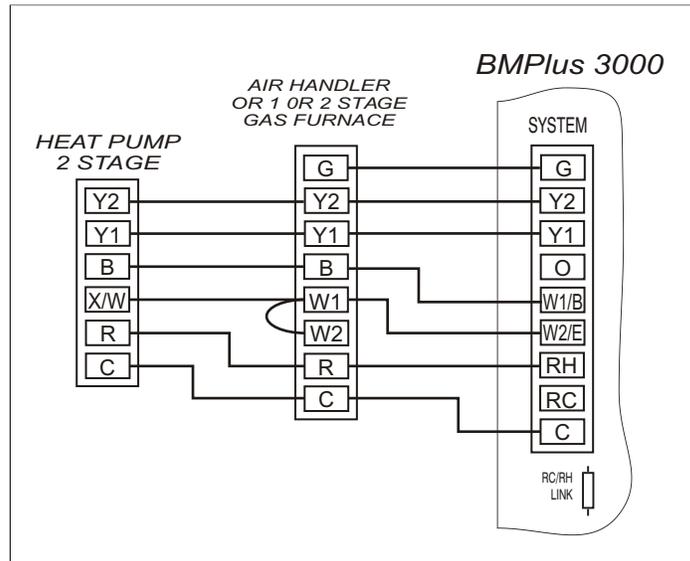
3 Heat / 2 Cool Heat Pump with B (Heat) Type Reversing Valve
